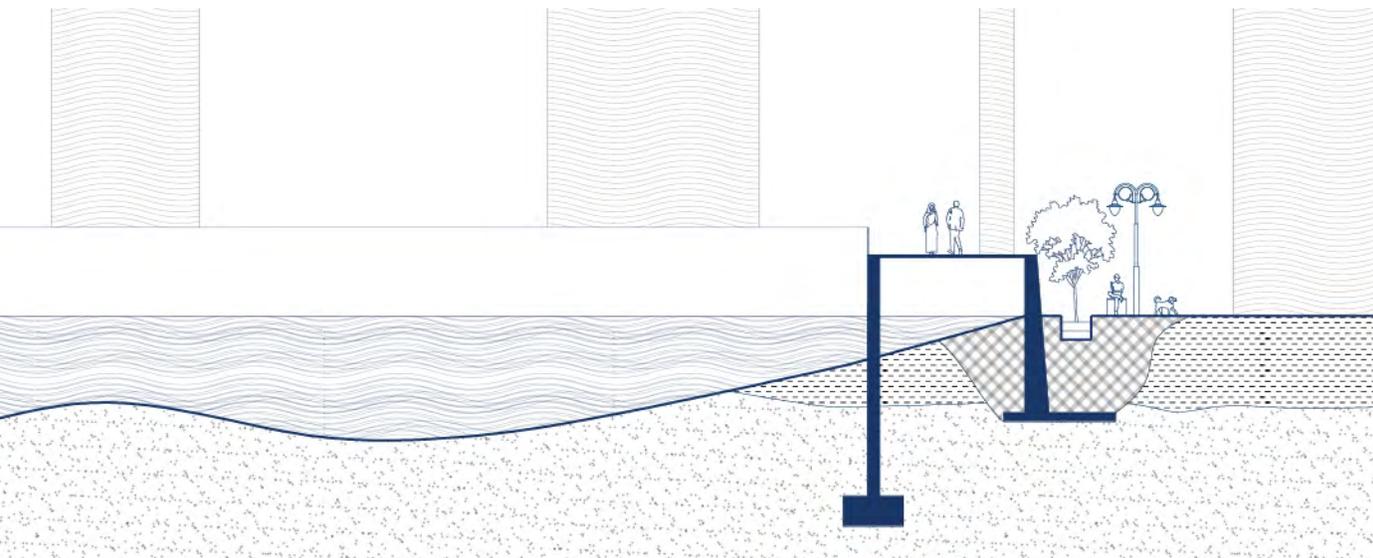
Sloped Embankment detail. Concrete blocks are shown in Figures 5.31 and 5.32.
